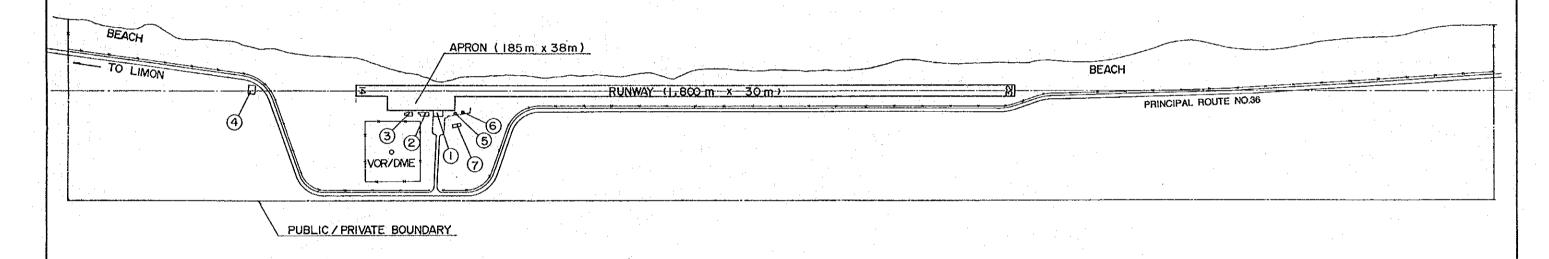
Layout Plan of Existing Limon International Airport
